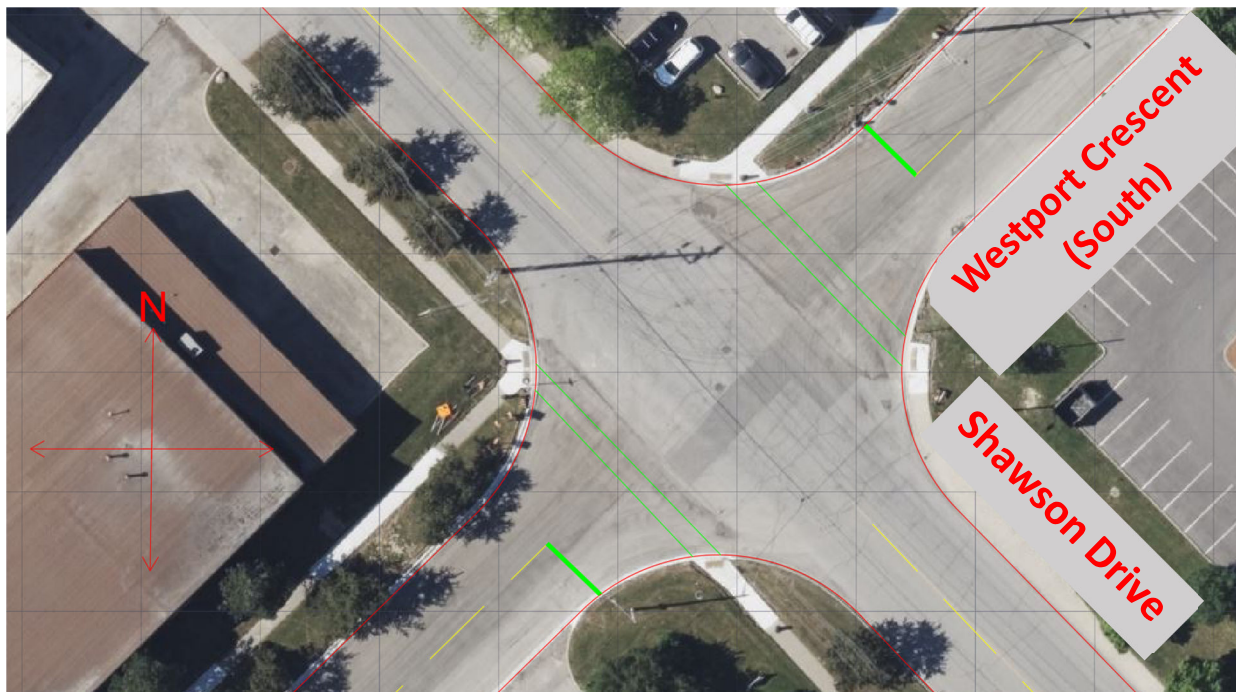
AutoCAD Drawing of Shawson Dr - Westport Cr S
